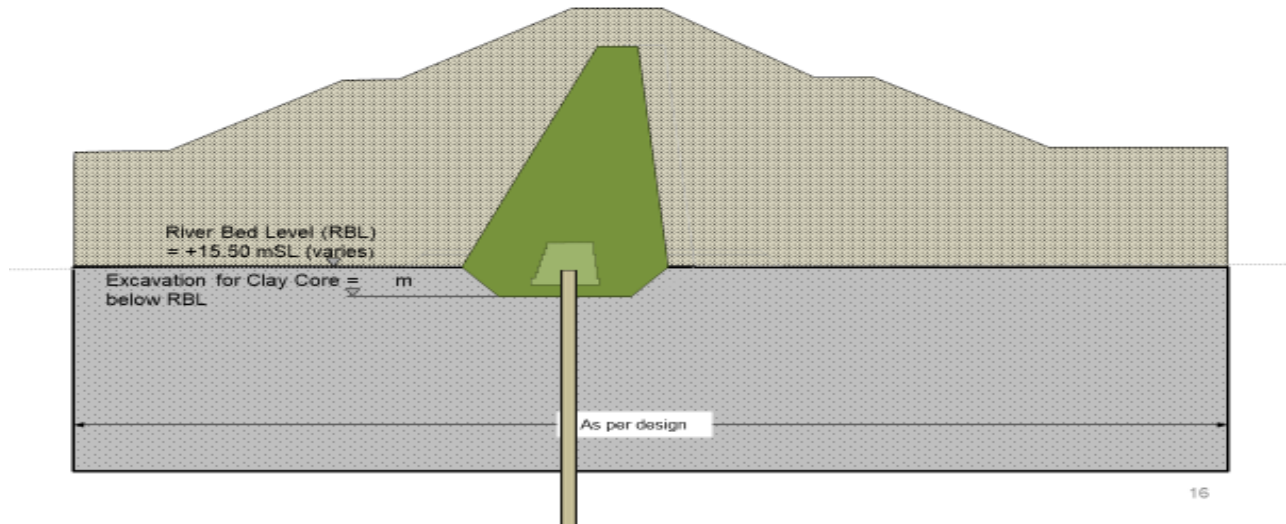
Typical Earth Cum Rock Fill Dam Section:
